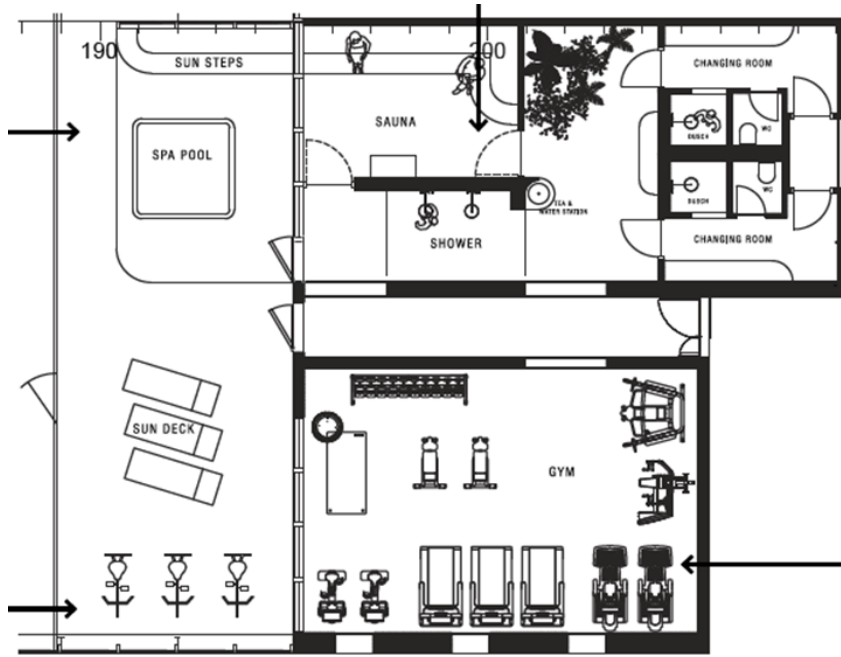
Floor plan of the gym, sauna, spa jacuzzi and sundeck
